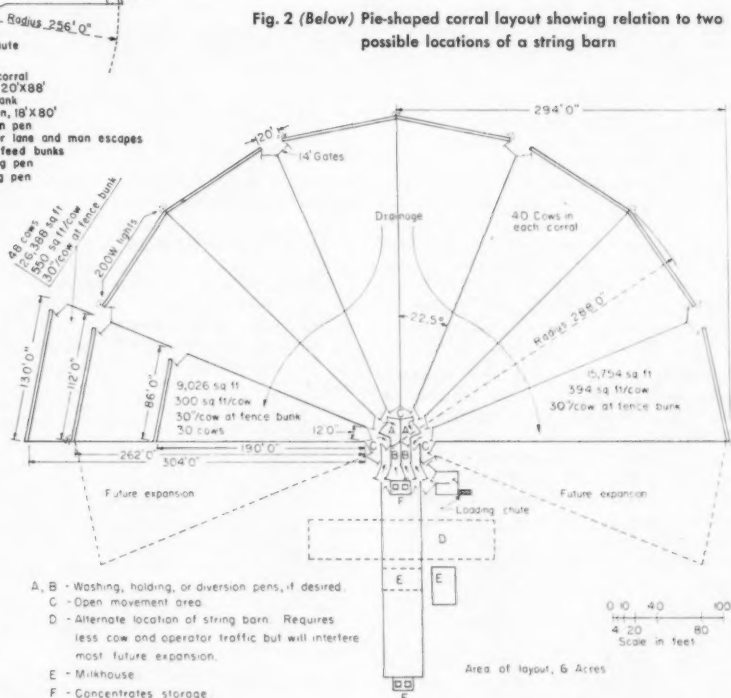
(Below) Pie-shaped corral layout showing relation to two possible locations of a string barn
